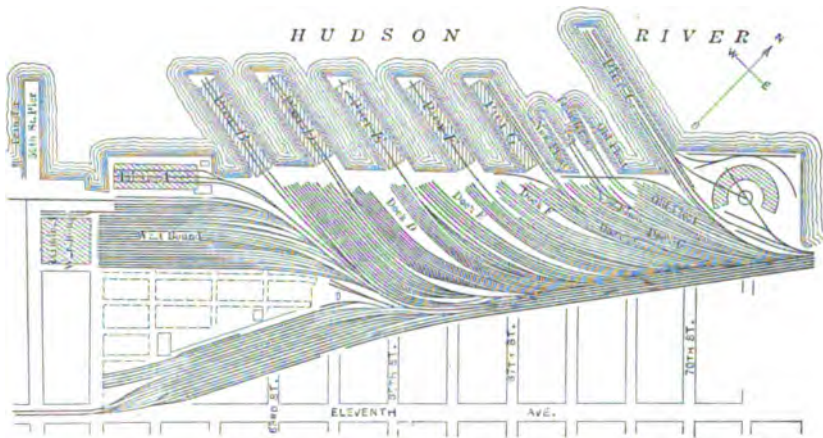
Plan of yards and piers, East 69th Street, New York City—New York Central.
